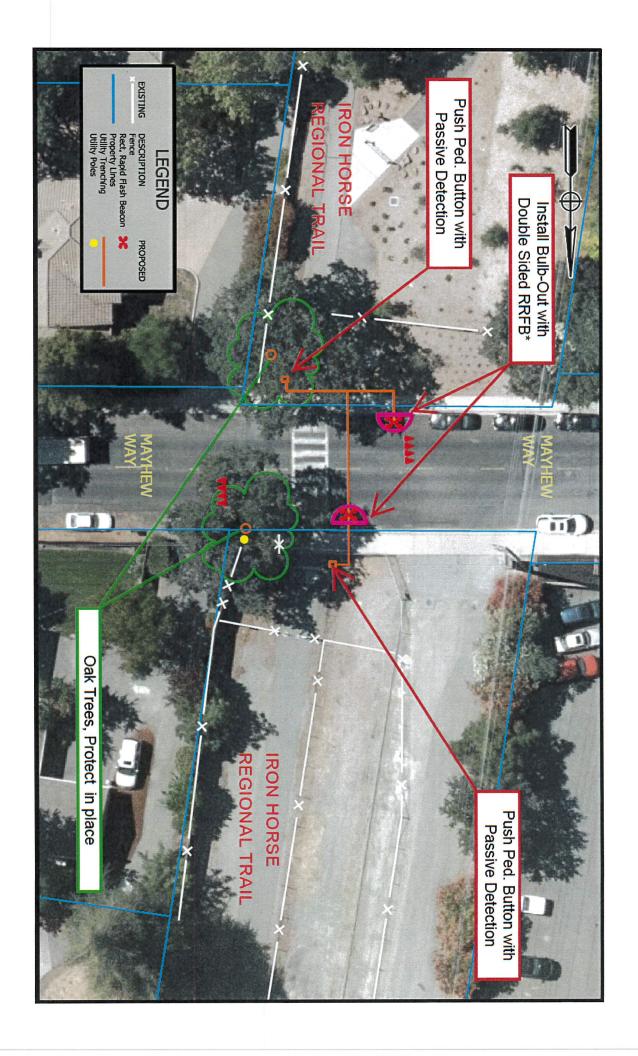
Proposed Layout, North Site (Mayhew Way Crossing) Mayhew Way and Cherry Lane Trail Crossing Enhancements Project
